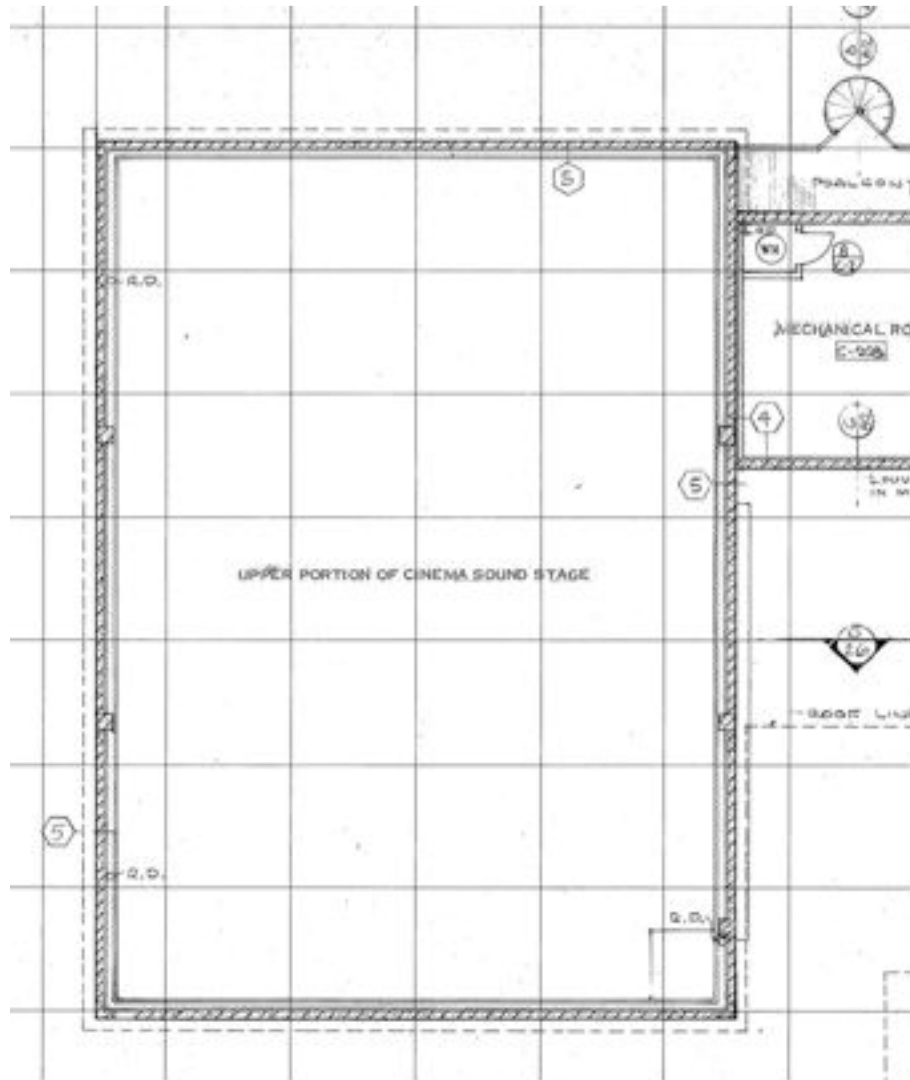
Floor plan of Harold Lloyd Soundstage
